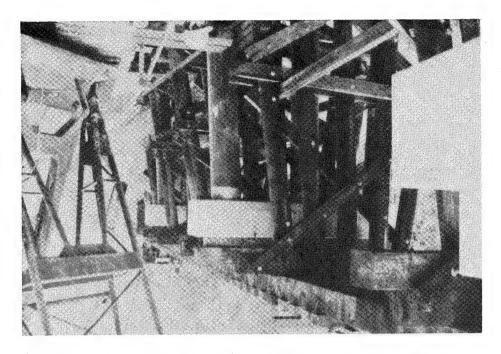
Precast concrete pile caps for replacement spans beneath timber trestle (from Marianos 1991)
